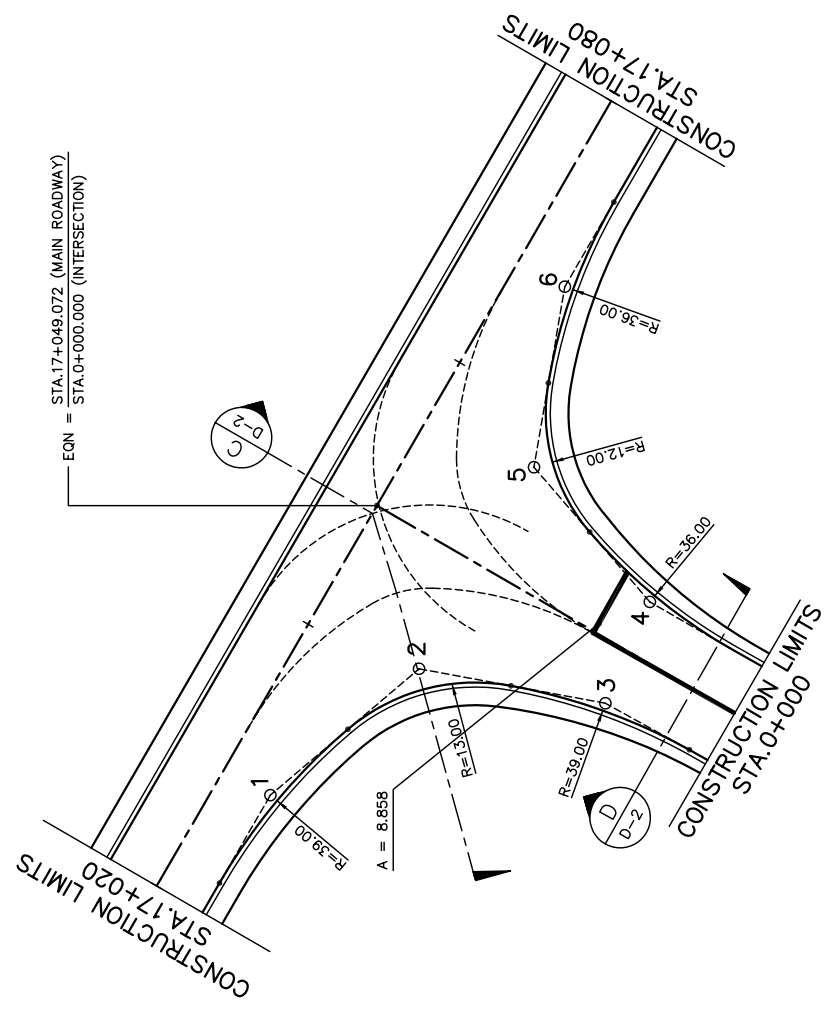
Baganuur Mining Intersection (Section II New Construction)
